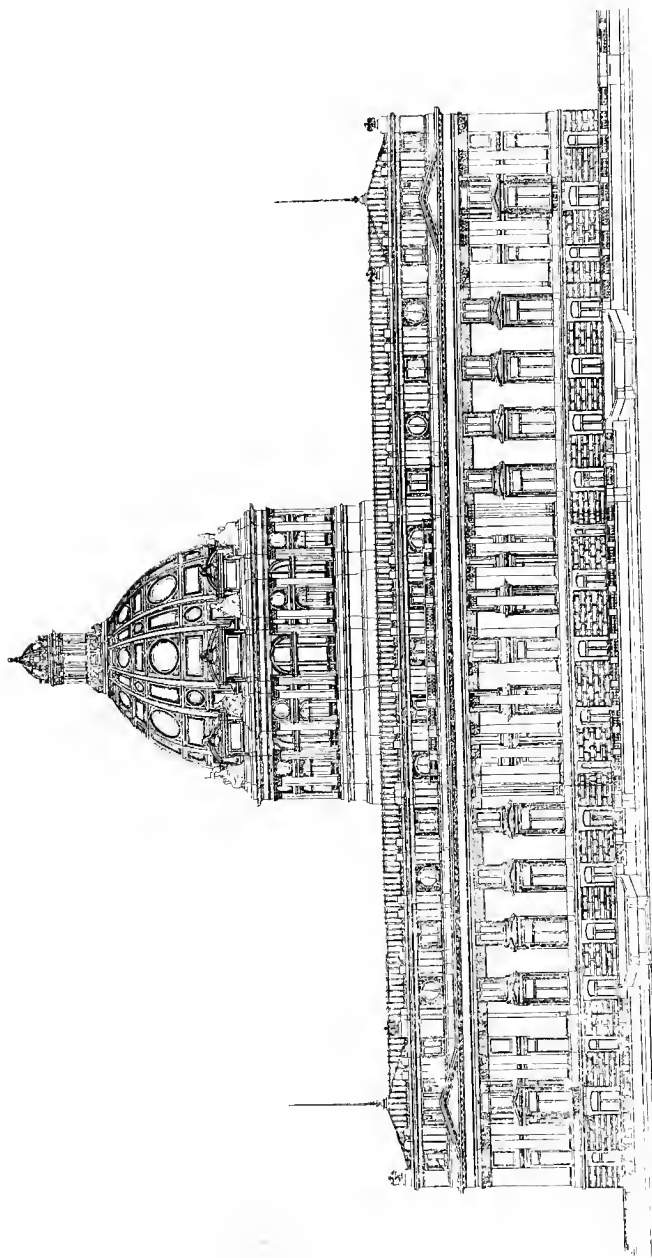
NORTH ELEVATION OF THE WASHINGTON (OLYMPIA) STATE CAPITOL.
